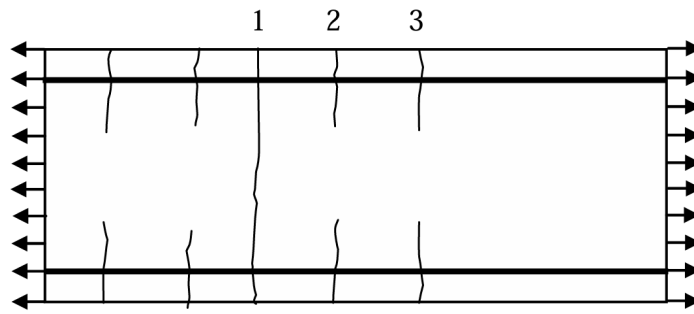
Order of crack-formation for a thick concrete member (Engström, 2014).
